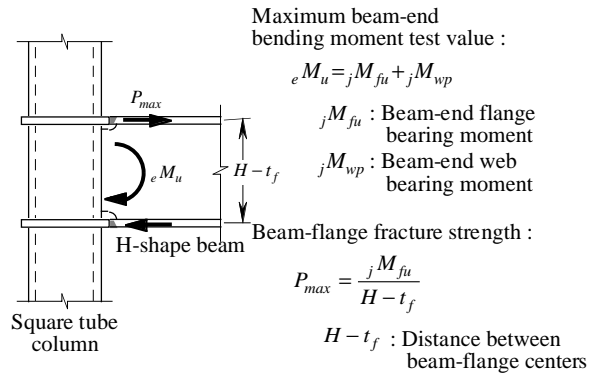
Estimation of Beam-flange Fracture Strength in the Cyclic Bending Tests
